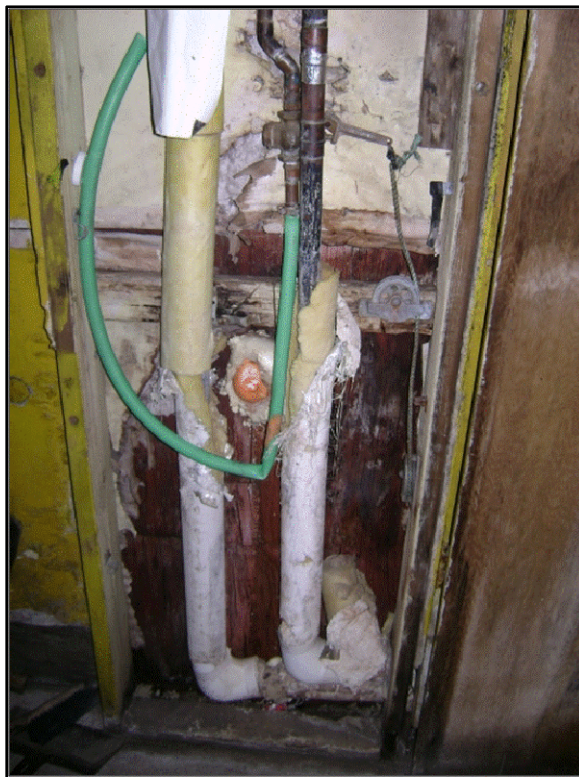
Abandoned watering point at south side of WTP showing deterioration of insulation and building envelope. Exterior siding is visible from building interior.
